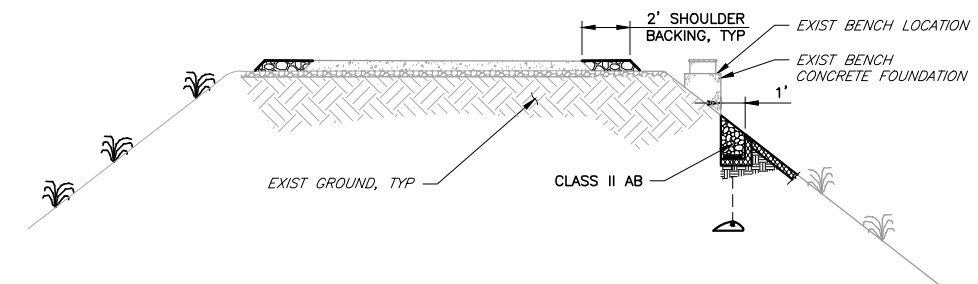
SLOPE LENGTH TRANSITION TO EARTH
